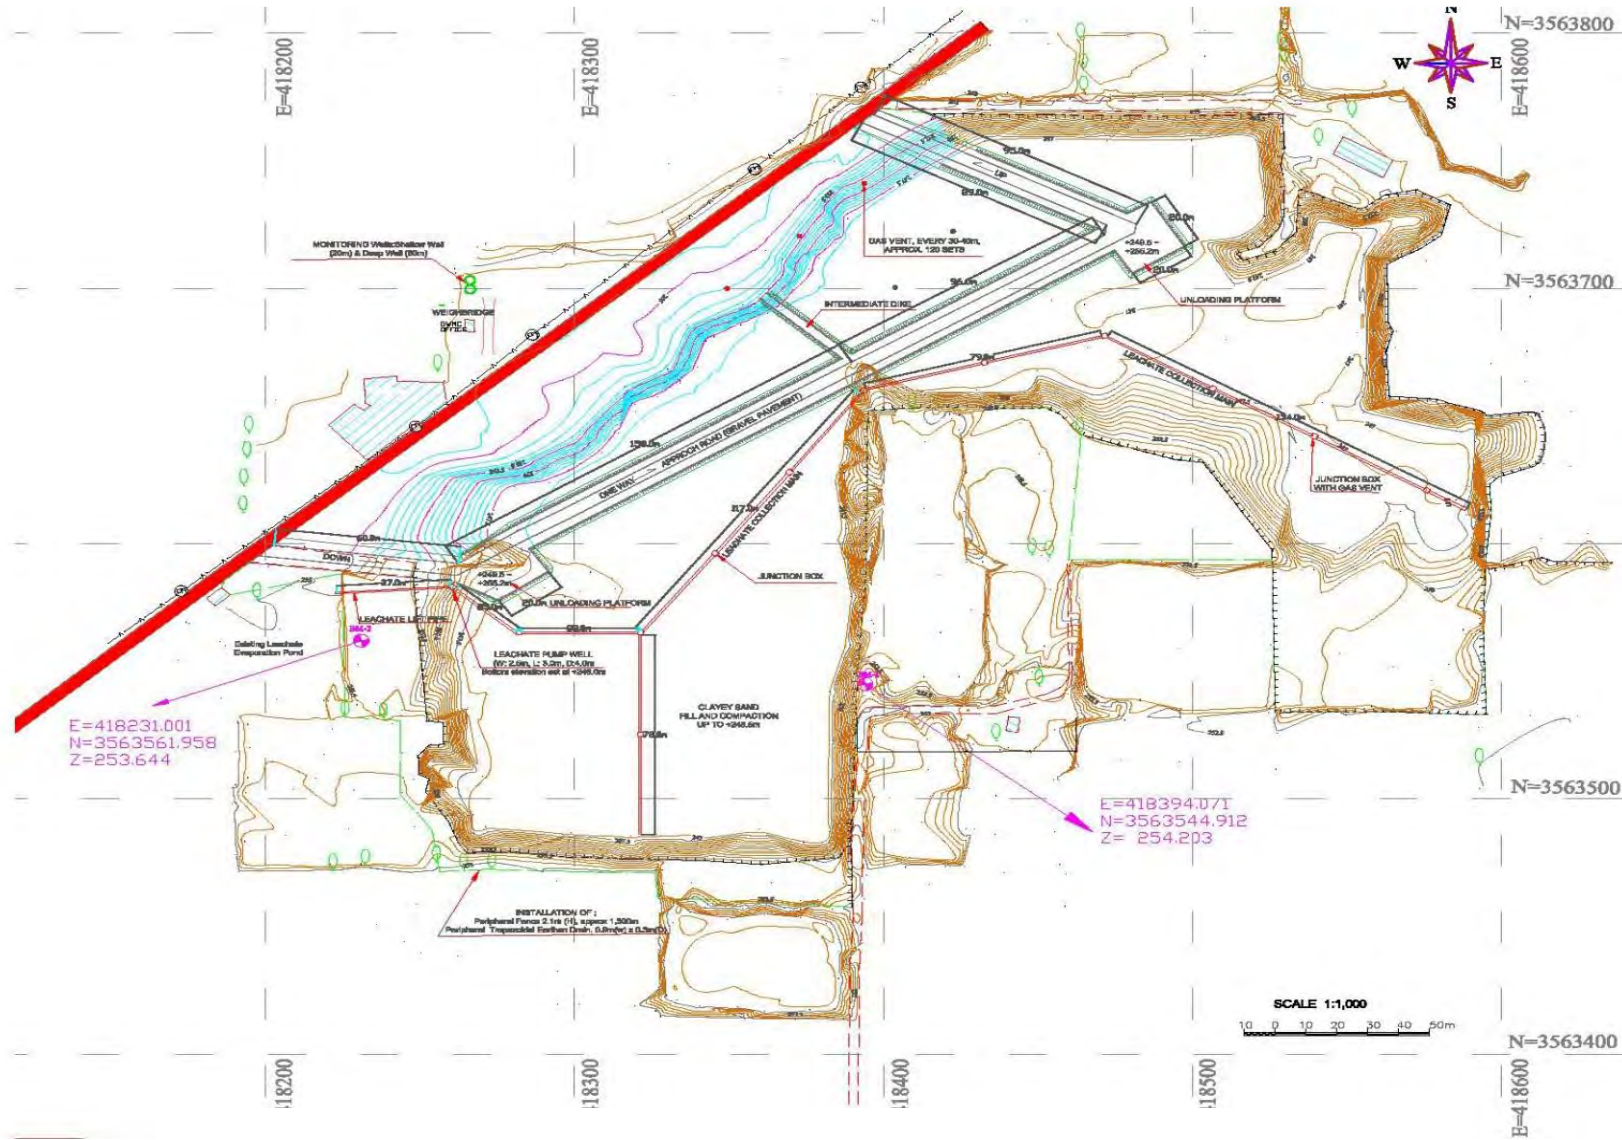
Layout Plan of Improvement Work at Gondlanwala Existing Disposal Site
